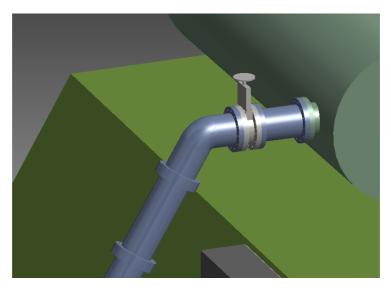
3D CAD drawing of penstock connection from forebay tank.
